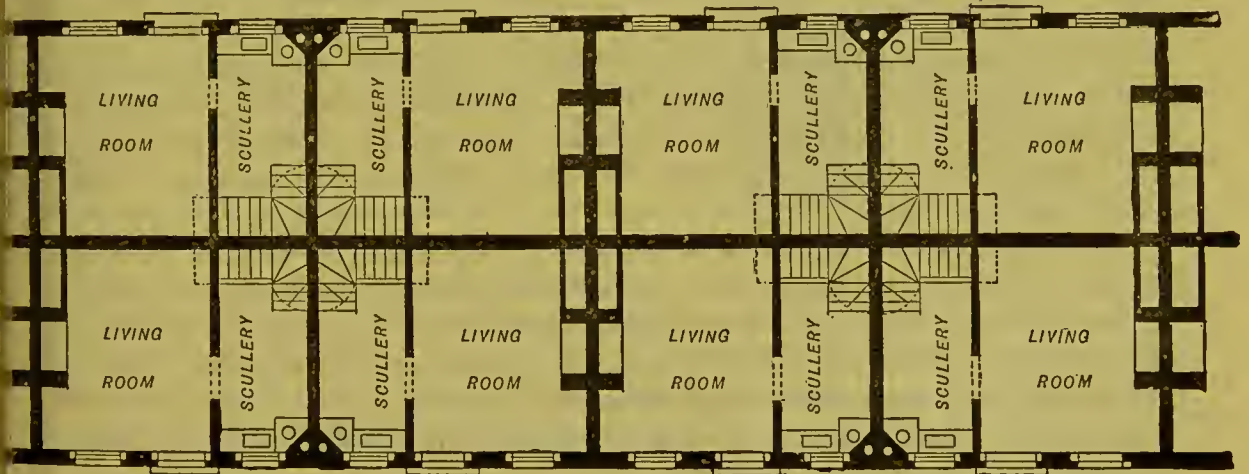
Ground Plan (Rooms 9' 0'' high. Basement beneath)
